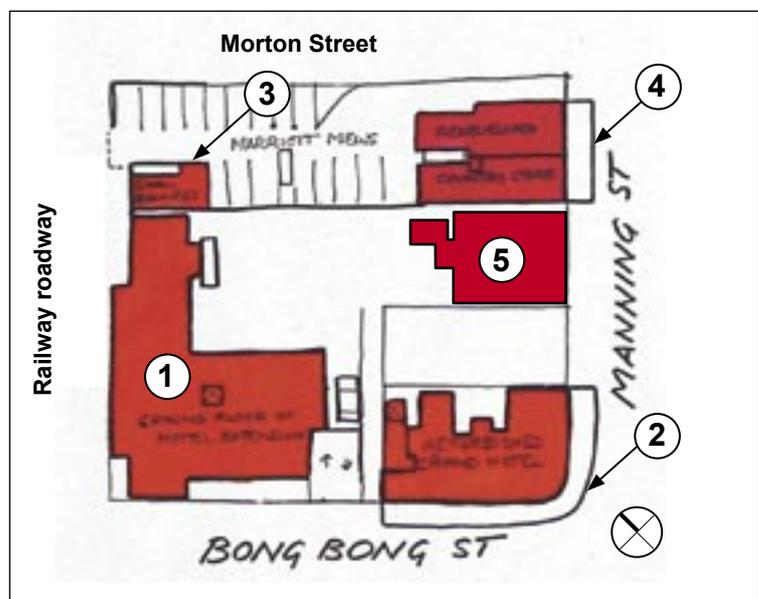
Proposed Ground Floor Plan of Grand Hotel Sub-Precinct
